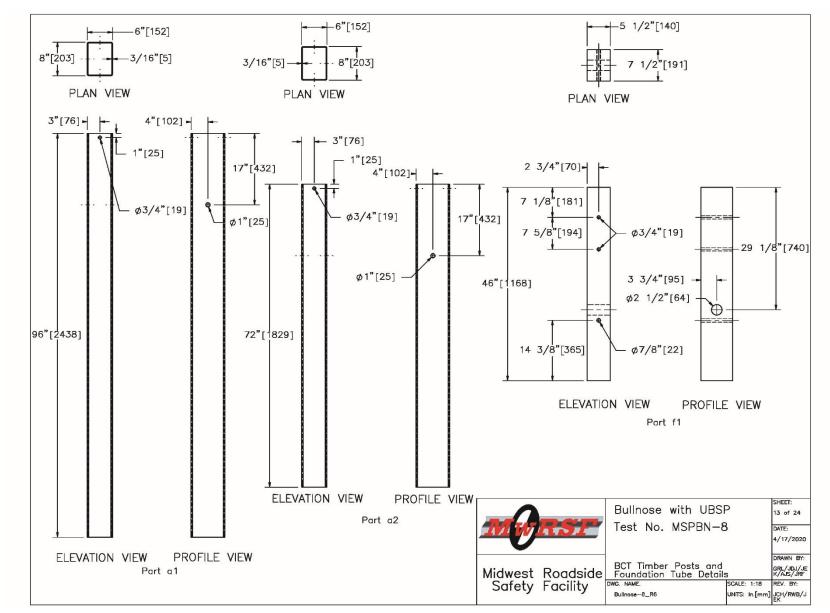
BCT Timber Posts and Foundation Tube Details, Test No. MSPBN-8
